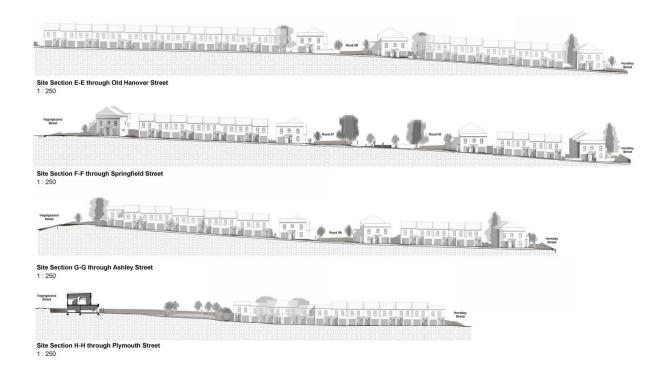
Sections through site (Section E-E to Section H-H)
